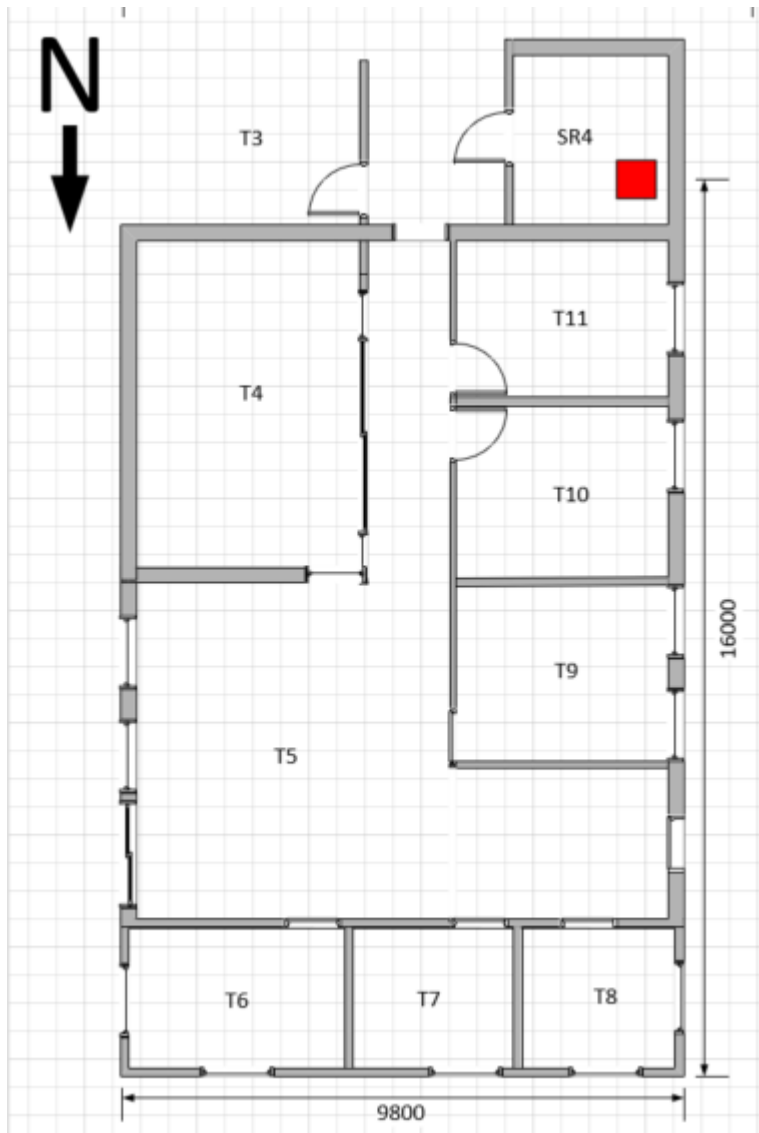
Floor plan of the Technical Building. The Roof Space in Figure 1 above is above Offices T6 – T8 and the equipment to be powered is in a small server roof SR4. There is a cavity ceiling throughout the building through which cables can be routed.
